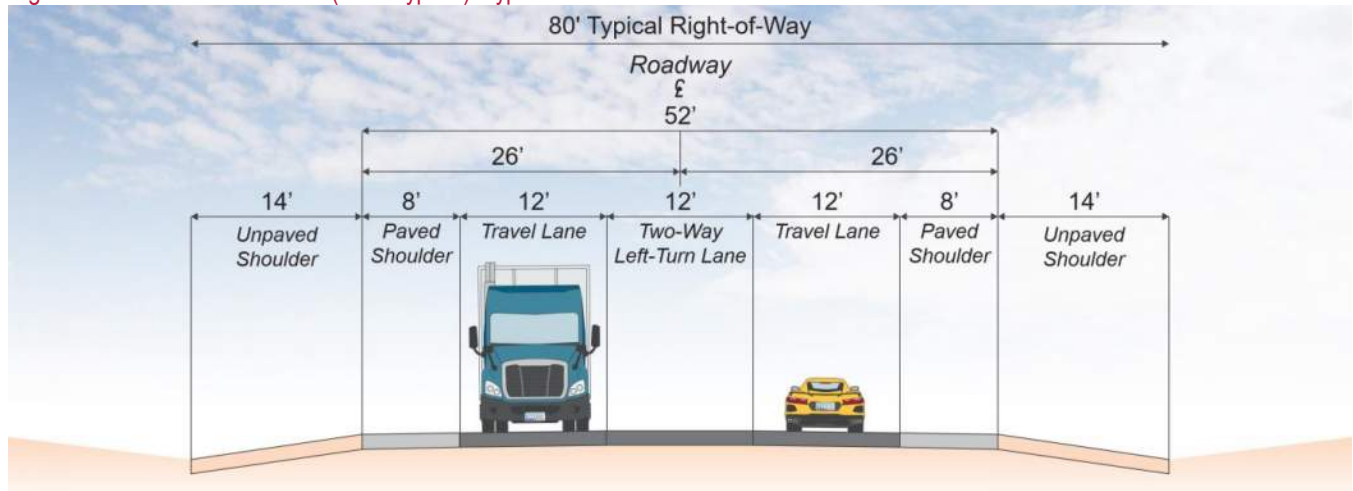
Alternatives E and F (East Bypass) Typical Cross-Section
